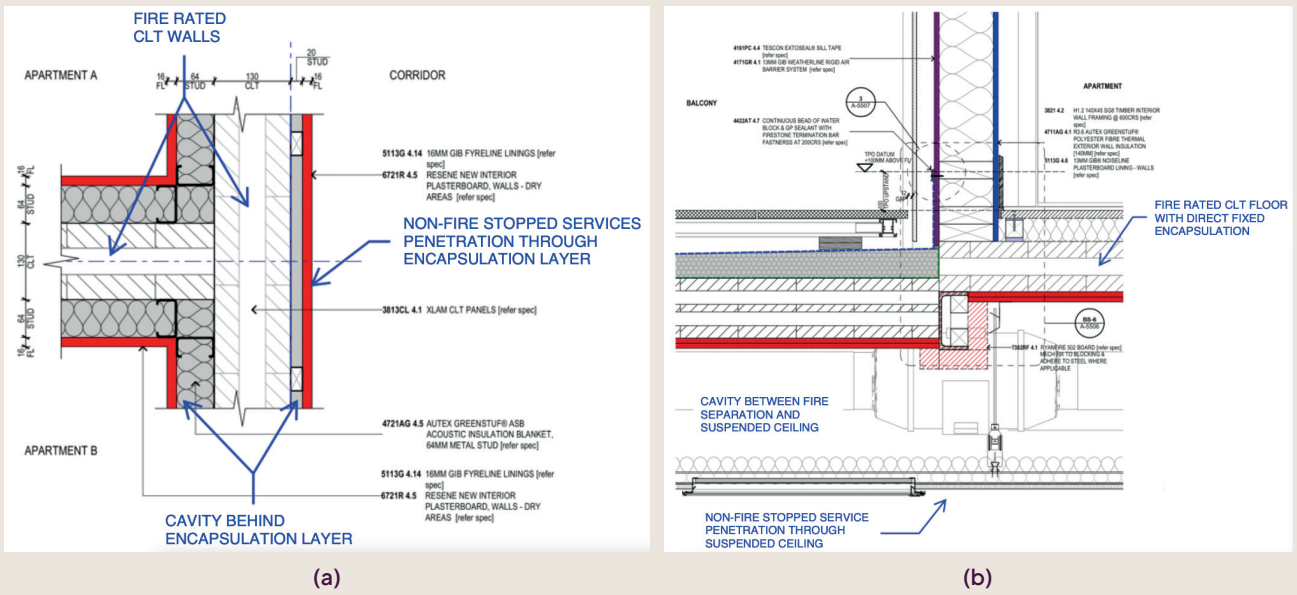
Services passing through false cavity outside the fire-separating element; (a) wall scenario, (b) floor scenario
